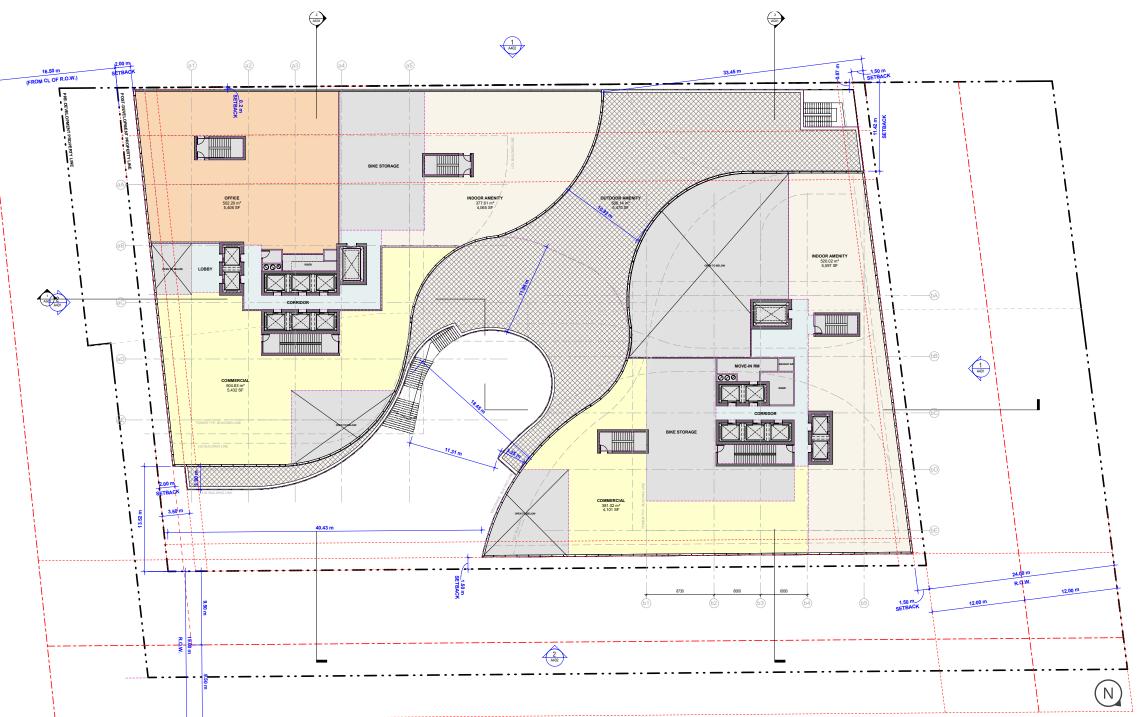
Level 4 Plan (Provided by Teeple Architects)
